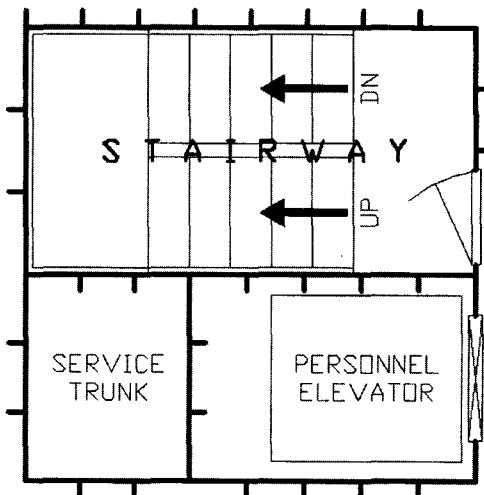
Stairway, Elevator and Service Access Trunk Arrangement
